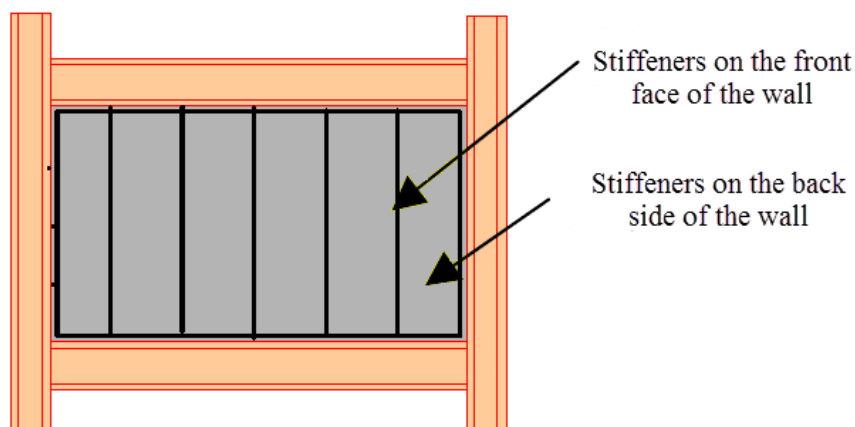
Stiffened steel plate shear walls (Astaneh-Asl, 2001)
